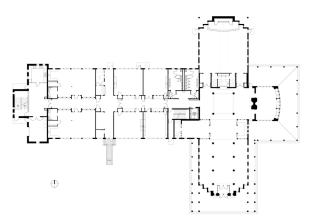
Ground Floor Plan, Schlitz Audubon Nature Center.
